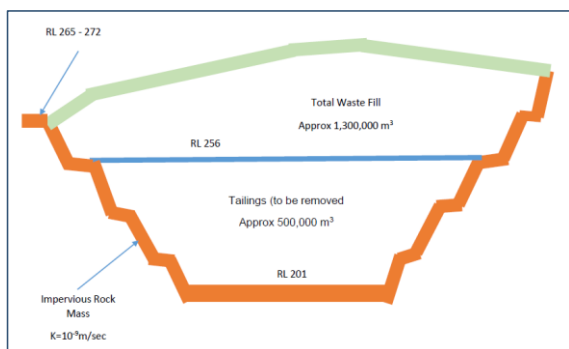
Cross Section View of Proposed White Crystal Landfill
